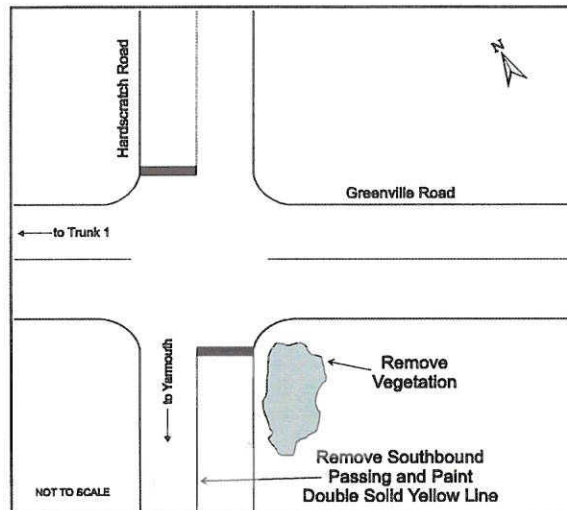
Proposed improvements to the Greenville Road - Hardscratch Road Intersection
